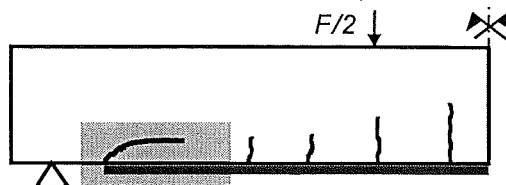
Typical Failure Mechanisms of RC Beams Strengthened with Externally Bonded ACM Laminates [A9]
